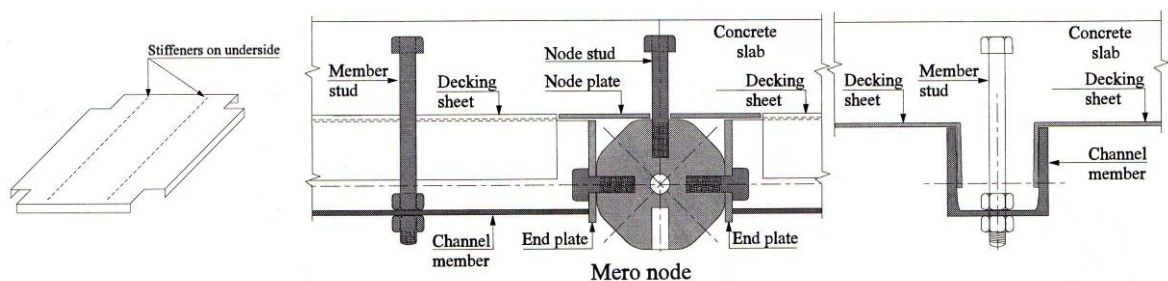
Details of Elsheikh and McConnel composite space truss system (Elsheikh and McConnel, 1993)
